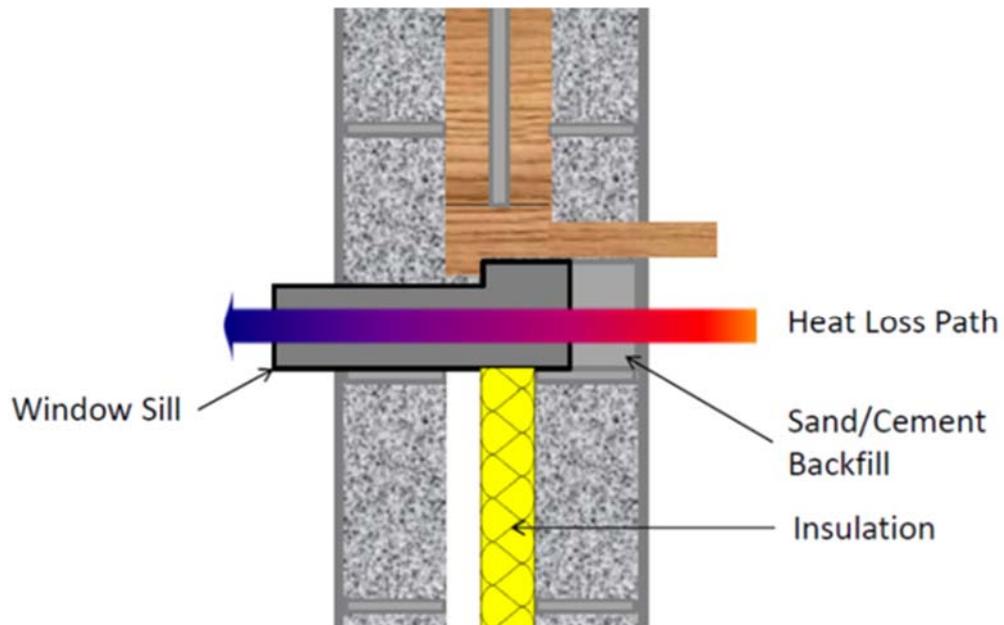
Cavity Wall Un-insulated Sill Detail showing Thermal Bridging
